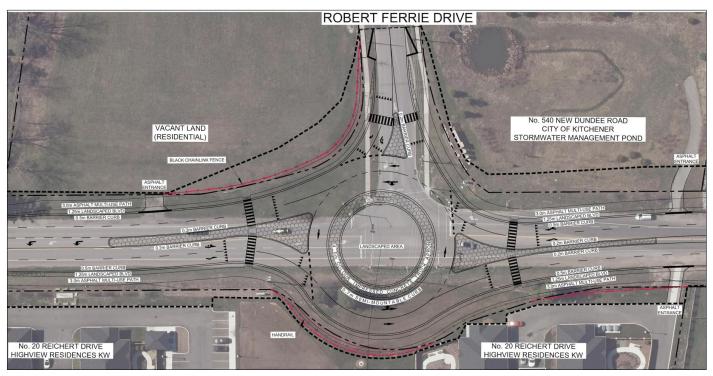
New Dundee Road and Robert Ferrie Road Proposed Roundabout Design
